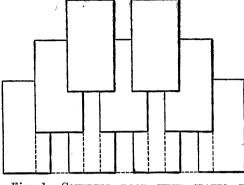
COVERING ROOF WITH SLATES IN EXTENDED ORDER
